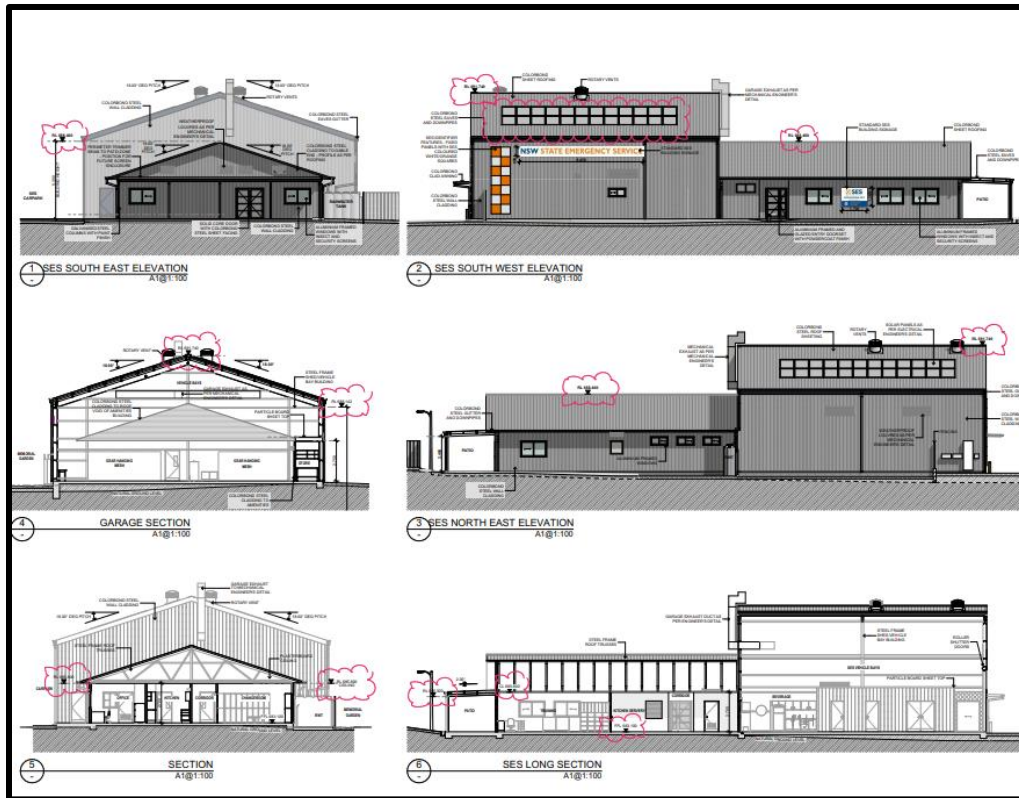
Elevations and Sections (Source: Figgis + Jefferson Tepa)
